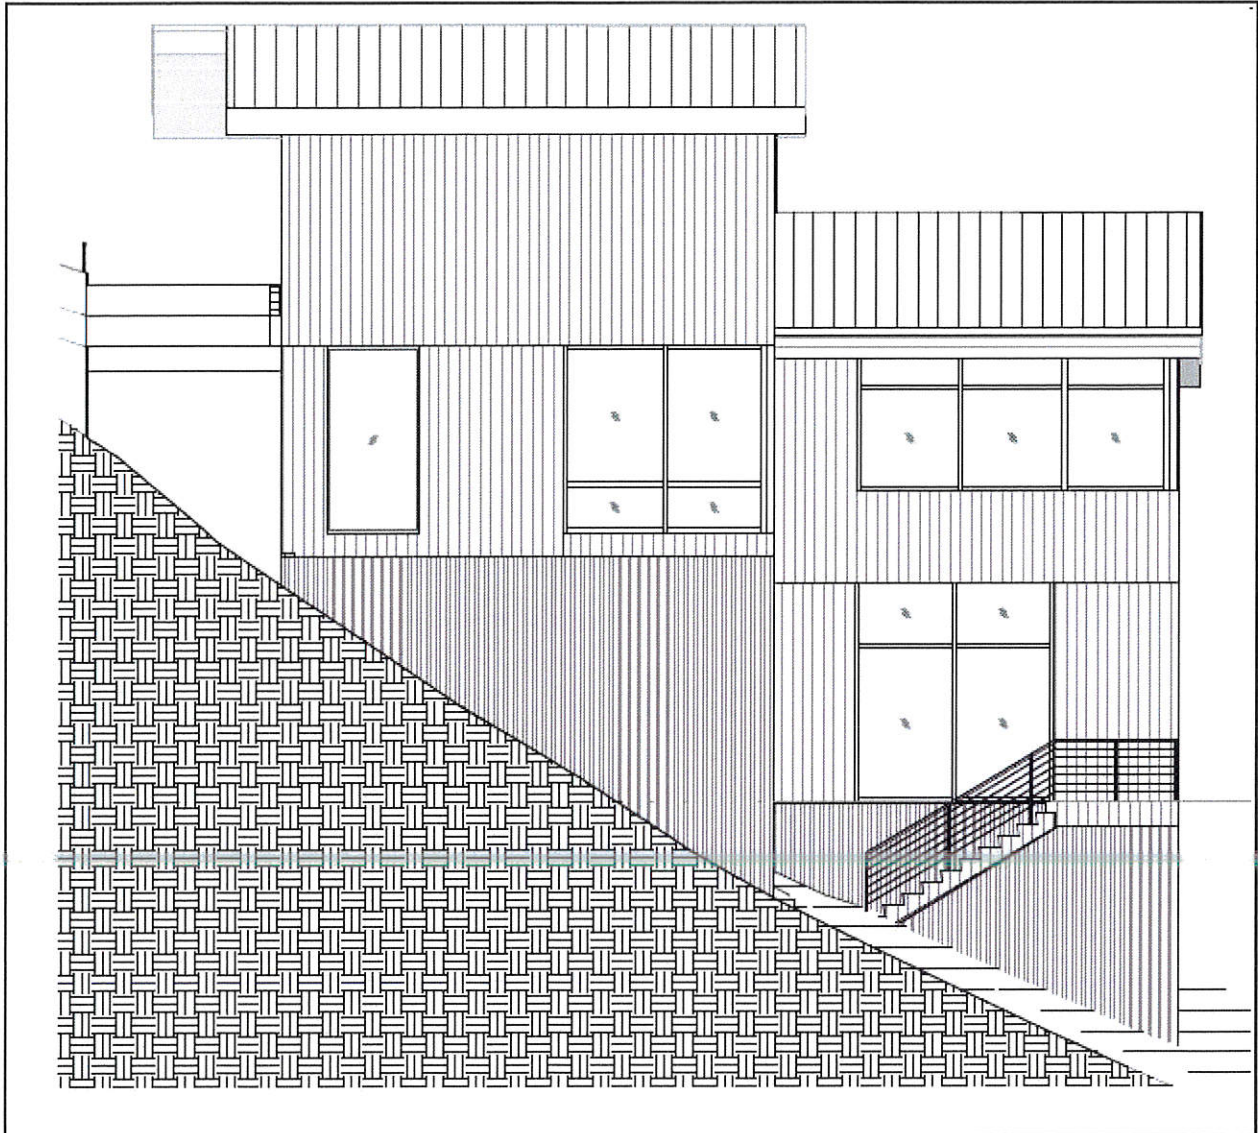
East-Elevation architectural concept sketch for proposed McGlynn House.
